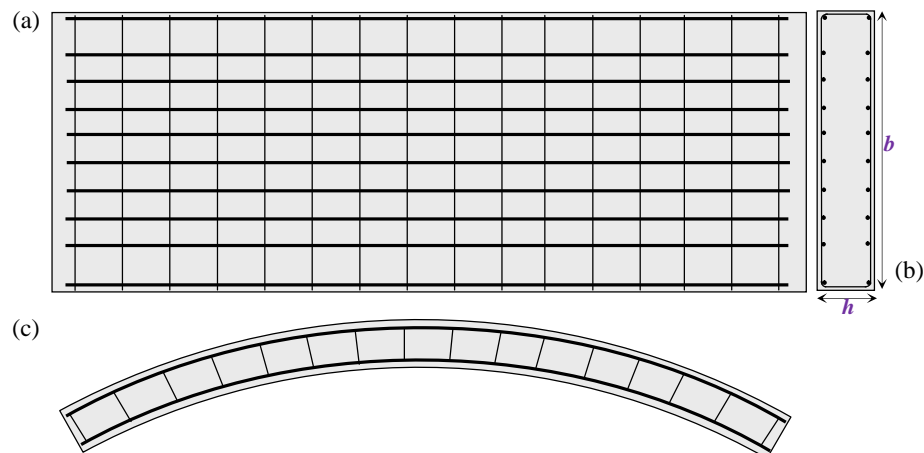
View (a) on floor, (b) transversal and (c) frontal of the configuration of a reinforced concrete segment.
